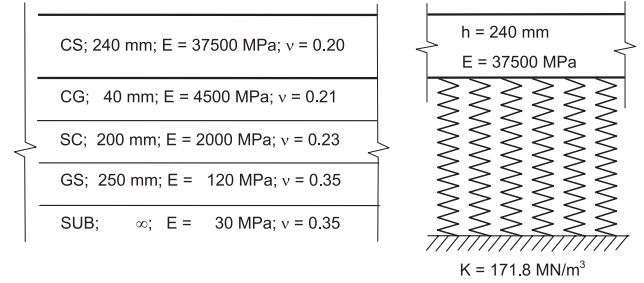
Pavement computing model, CS – concrete slab, CG – coated gravel, SC – soil cement, GS – gravel sand, SUB – subgrade
